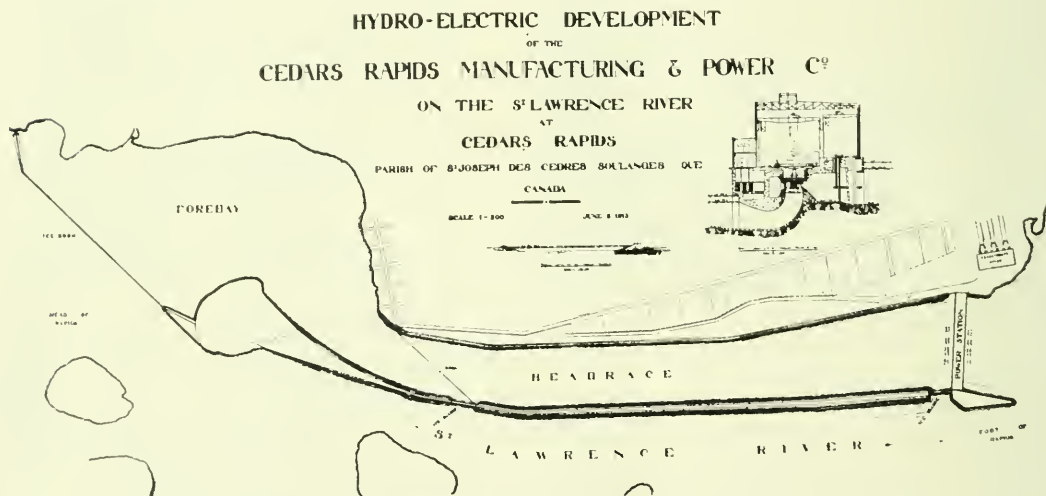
General plan of Cedars Rapids Manufacturing and Power Company's Development.
